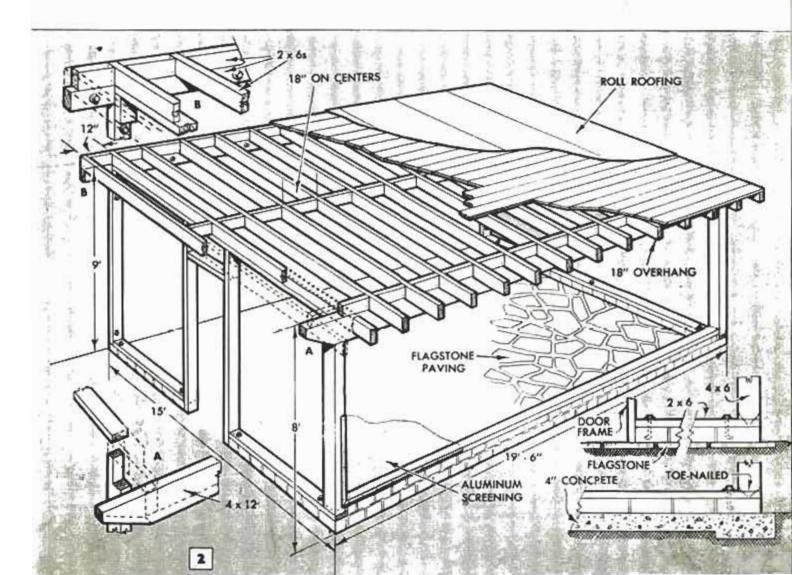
illustrates a screened-in addition that was built over a flagstone patio which had been laid some years earlier. Concrete blocks were mortared to the flagstones, then filled with concrete in which several anchor bolts were positioned. A 2 x 6 sill plate then was drilled to fit over the bolts. Instead of concrete blocks, a concrete footing could be poured, with forms above ground, to provide a low wall. Or a footing flush with the ground could have a brick or concrete wall built on it. It is not advisable to have lumber directly on the ground because of the moisture problem. Although the details in Fig. 2 show the 4 x 6 corner posts to be toe-nailed to the sill plate, it actually would be easier to build the end walls complete on the ground. then have a friend help you raise them into position. Nails could be driven up through the sill plate into the columns. The frame member next to the house is drilled for lag or anchor bolts. Their locations are marked through the frame member, and the wall is moved aside while the holes are drilled and the anchors inserted. The wall framing then is fitted on the foundation and against the house wall, and bolted in place. Note in the detail in Fig. 2 that the 4 x 6 end members of the frames are half-lapped to accept the 4 x 12 timber that spans the length of the room addition.
